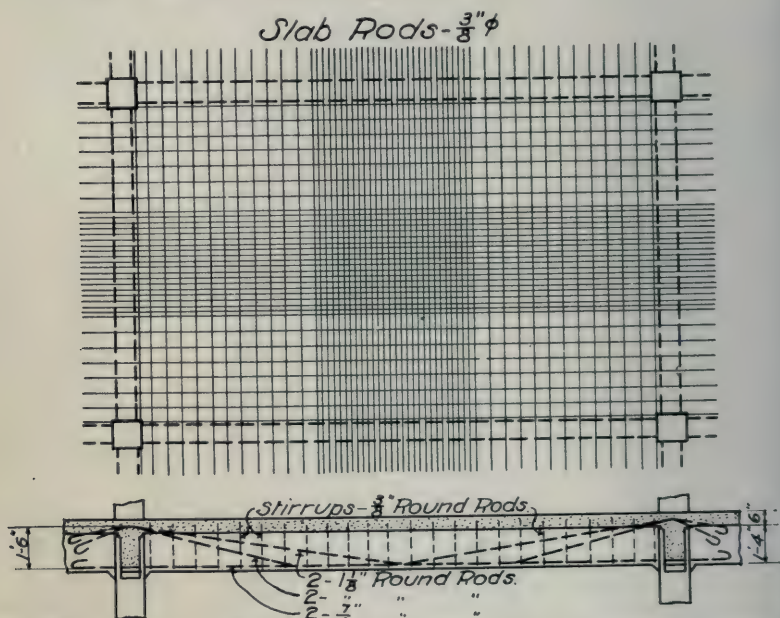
Detail of slab reinforcement, Minneapolis Paper Co. building.
